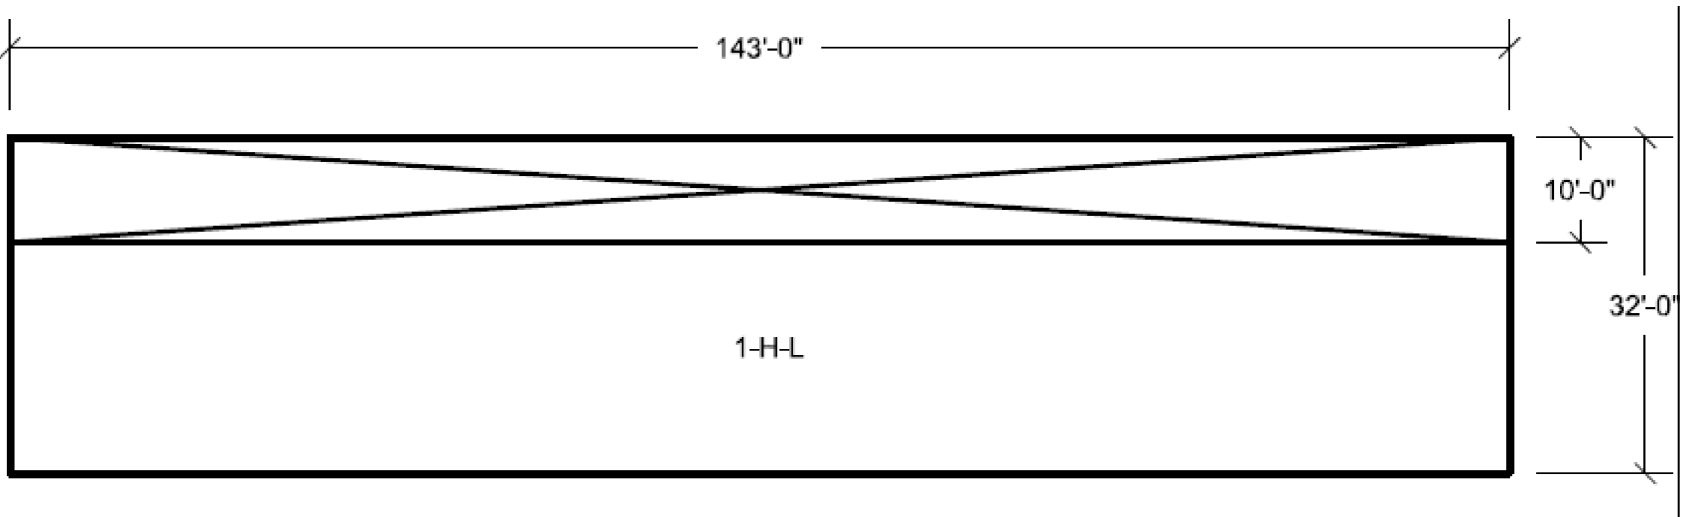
H.6-63 Pump House South Wall Looking South Horizontal Reinforcement Zones Far Side Face
